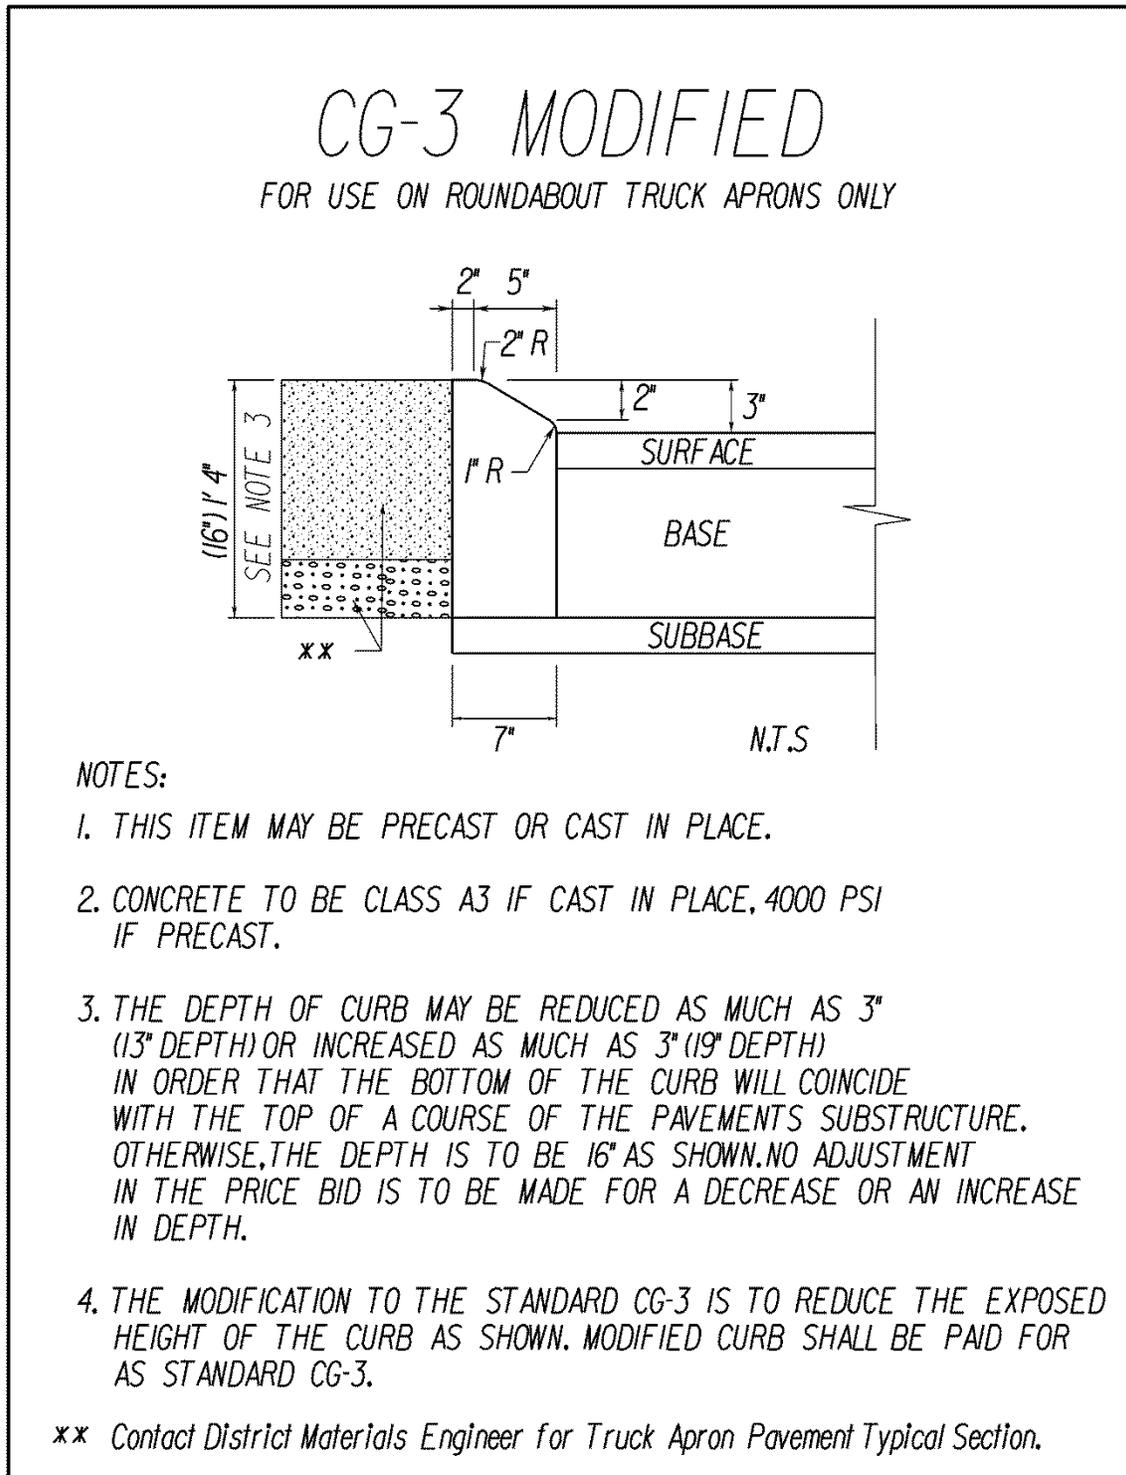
ROUNDABOUT TRUCK APRON CURB DETAIL
